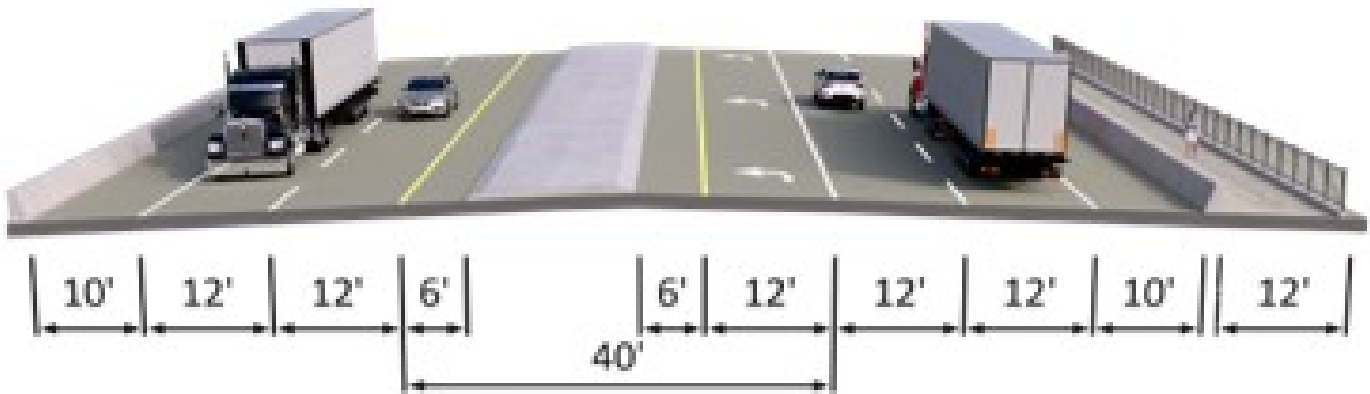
Preferred Alternative Bridge Typical Section - S.R. 70 over Harney Pond Canal C-41
